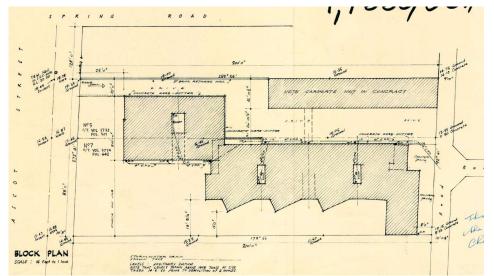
Architectural drawings showing the layout of the new OYO flats to be built at 5-7 Ascot Street, 1960, Note the carport did not form part of the contract (SHC)
